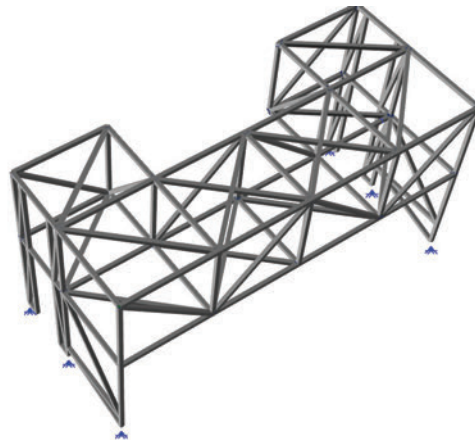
Excerpt Structural Model of Bridge Spanning Portion Only
